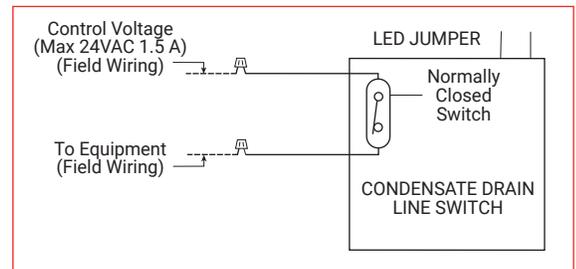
FIG. G: WIRING DIAGRAM WITH CUT JUMPER WIRE
